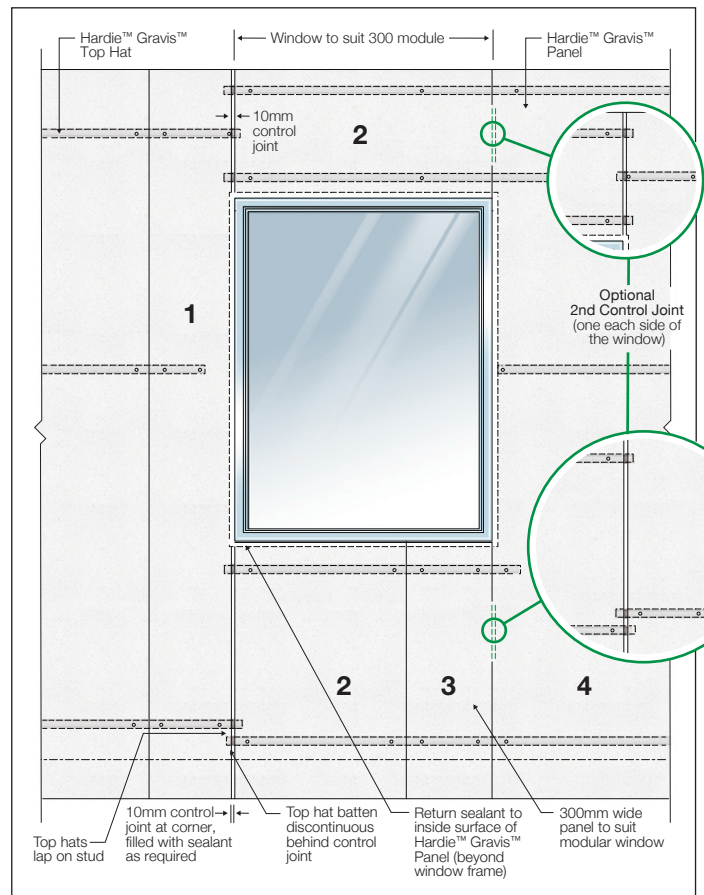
VERTICAL WINDOW CONTROL JOINT WITH LINTEL
